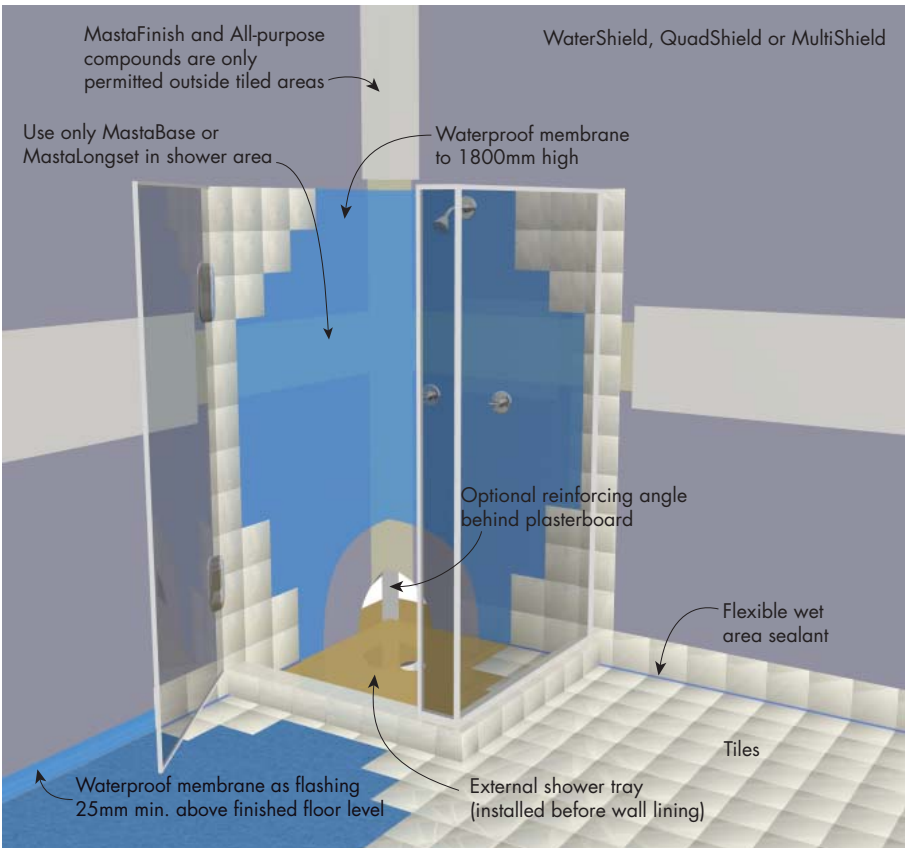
External Tray for Enclosed Shower on Timber Flooring
